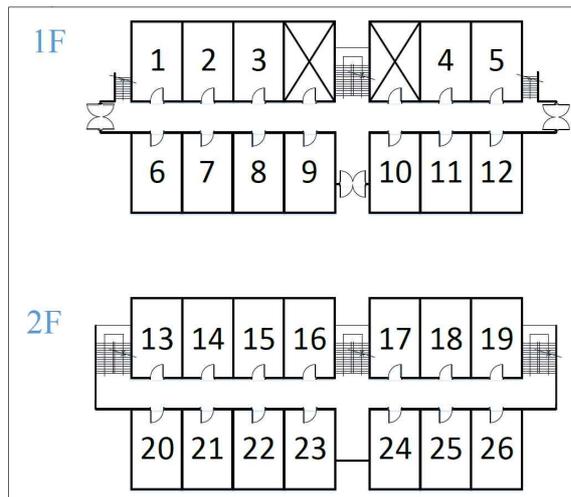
4 CO barracks layout possible (2-floor double corridor)
